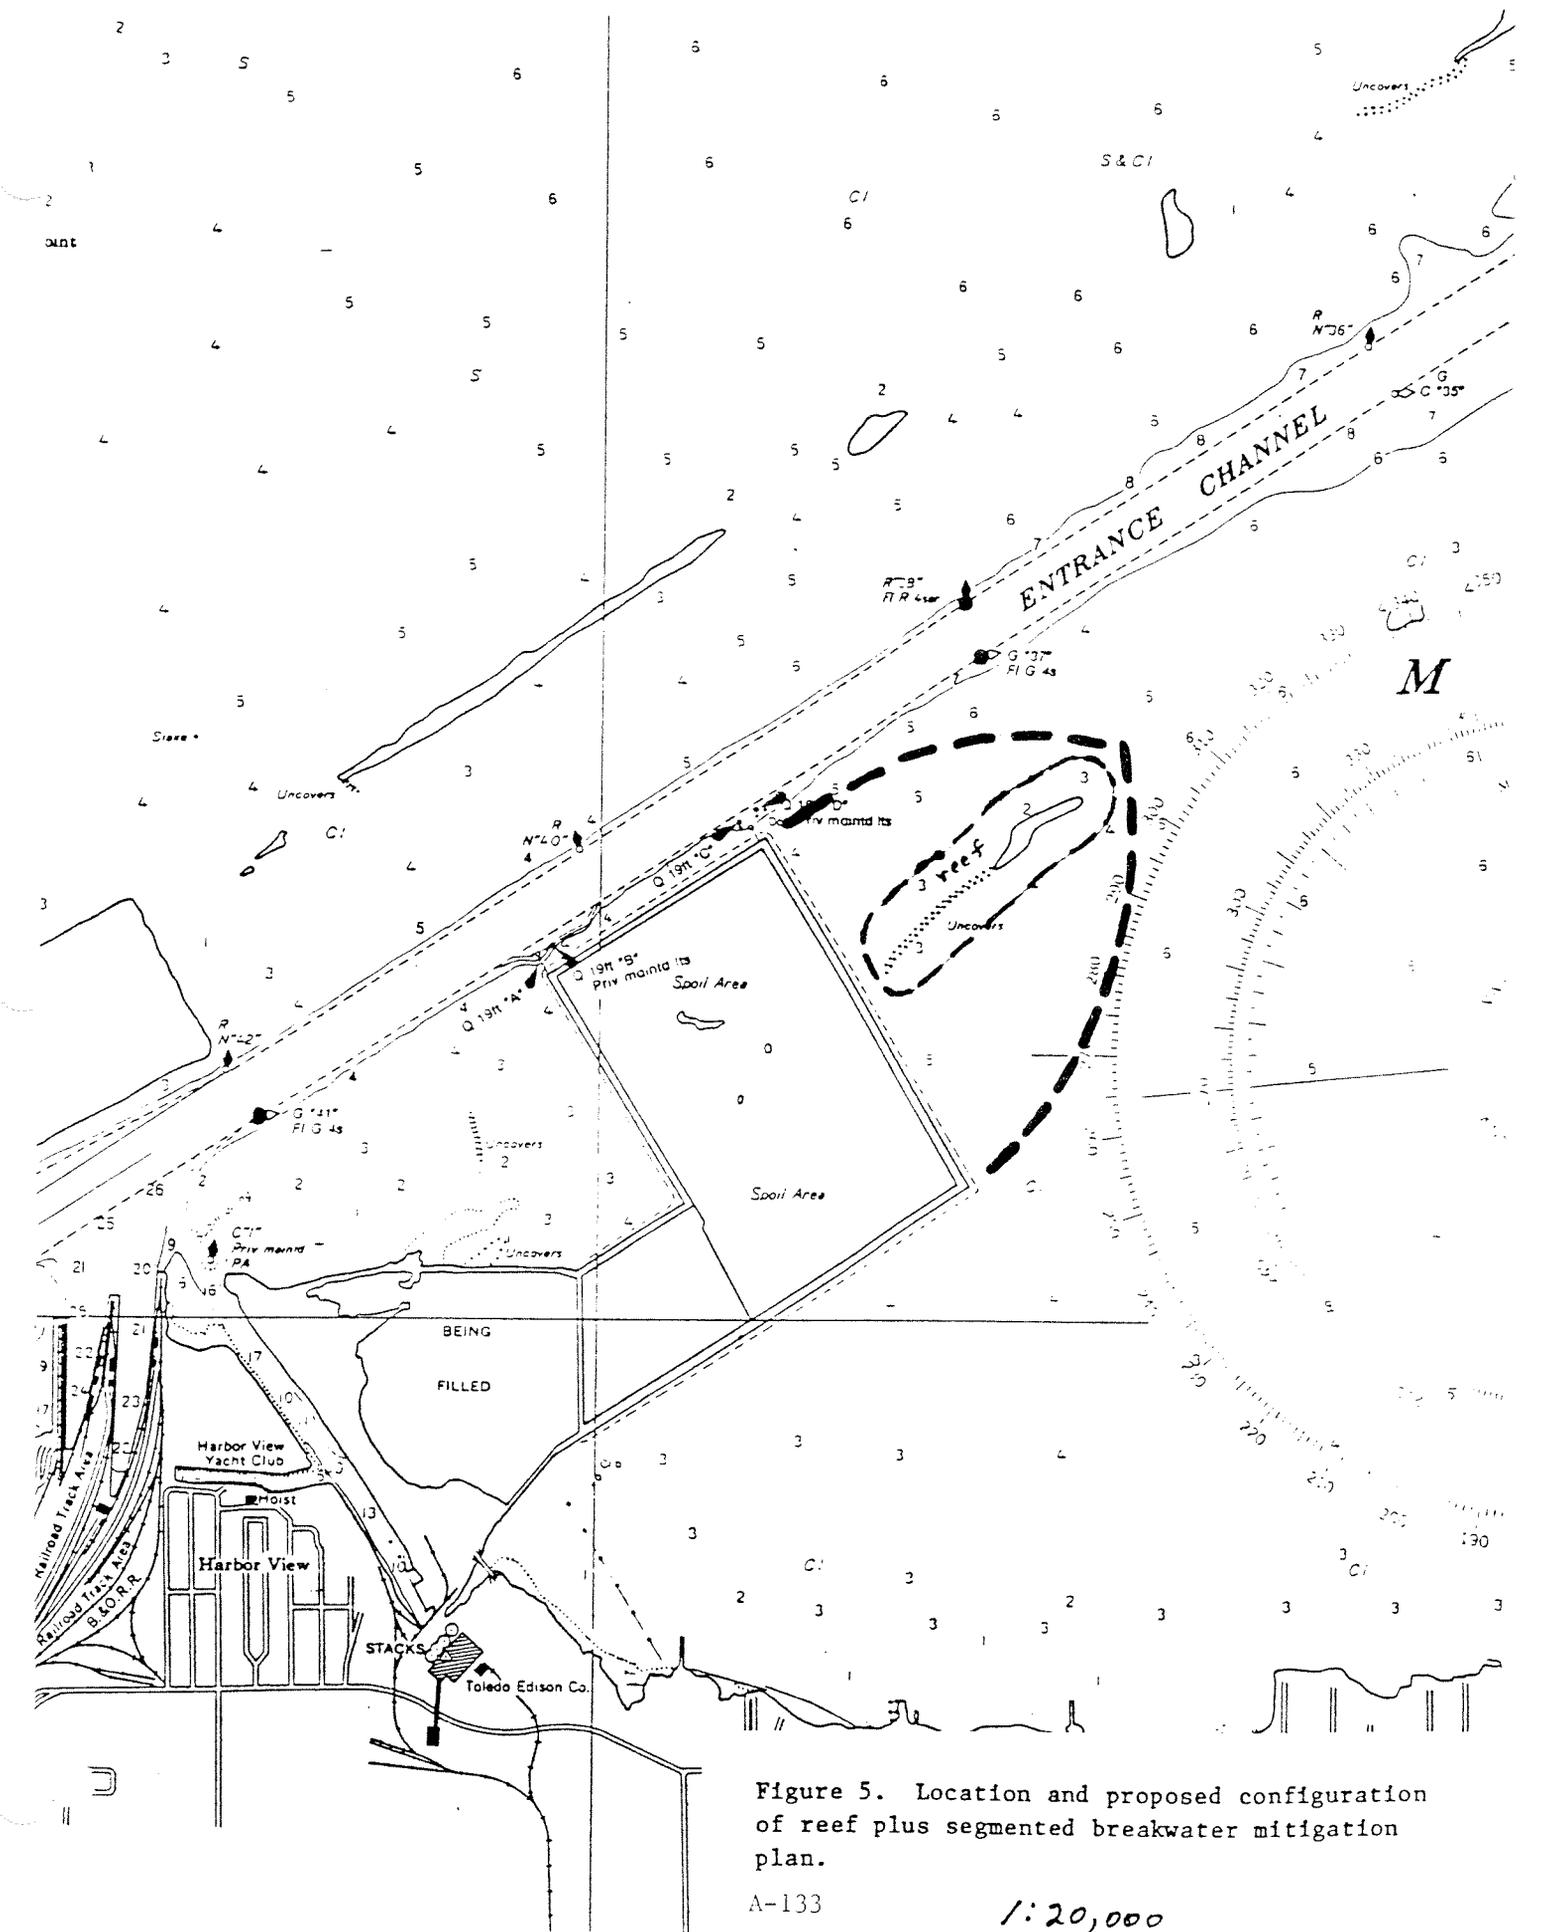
Location and proposed configuration of reef plus segmented breakwater mitigation plan.
